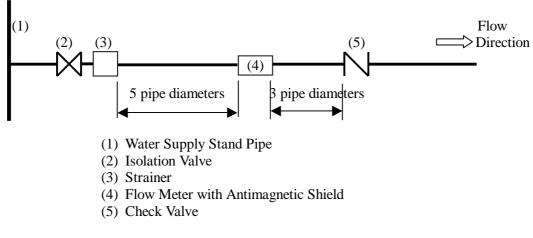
Typical Domestic Water Meter Connection Diagram
